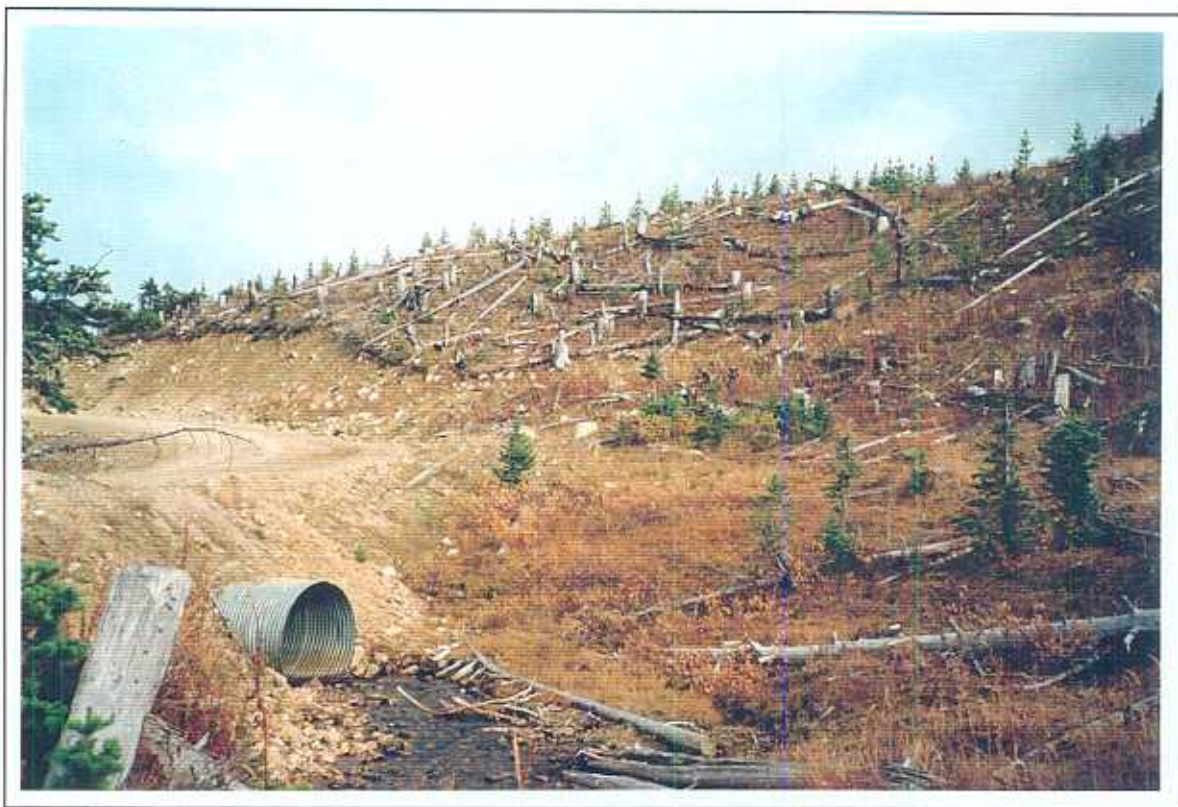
Granite Creek. View of Site 4 facing culvert. Note banks barren at culvert.
